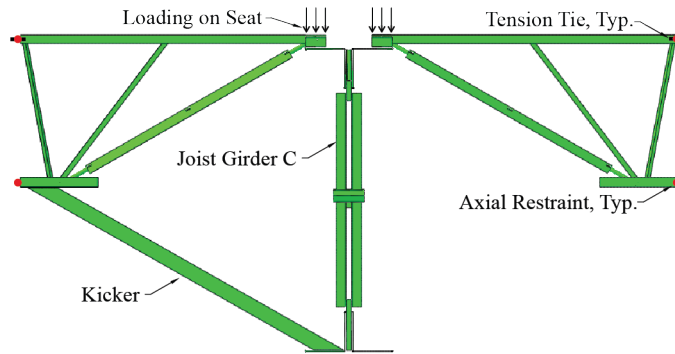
Joist Girder C joist seat and lateral bracing support
